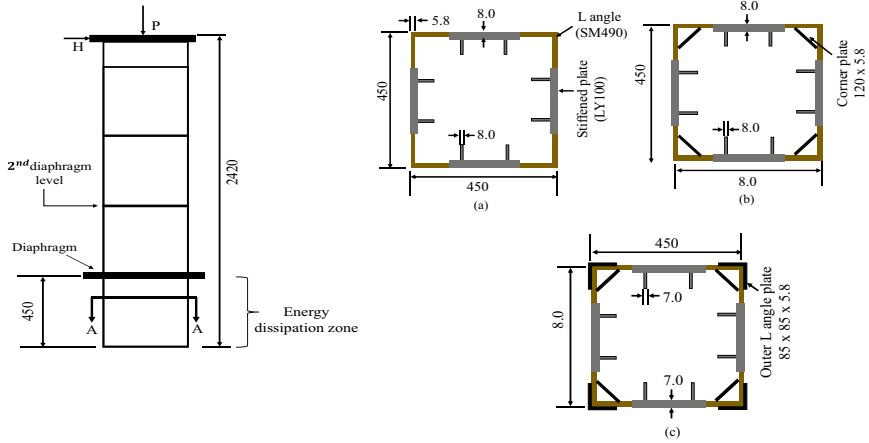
Longitudinal and cross sections of standard column SM-B (Dimensions in mm)
